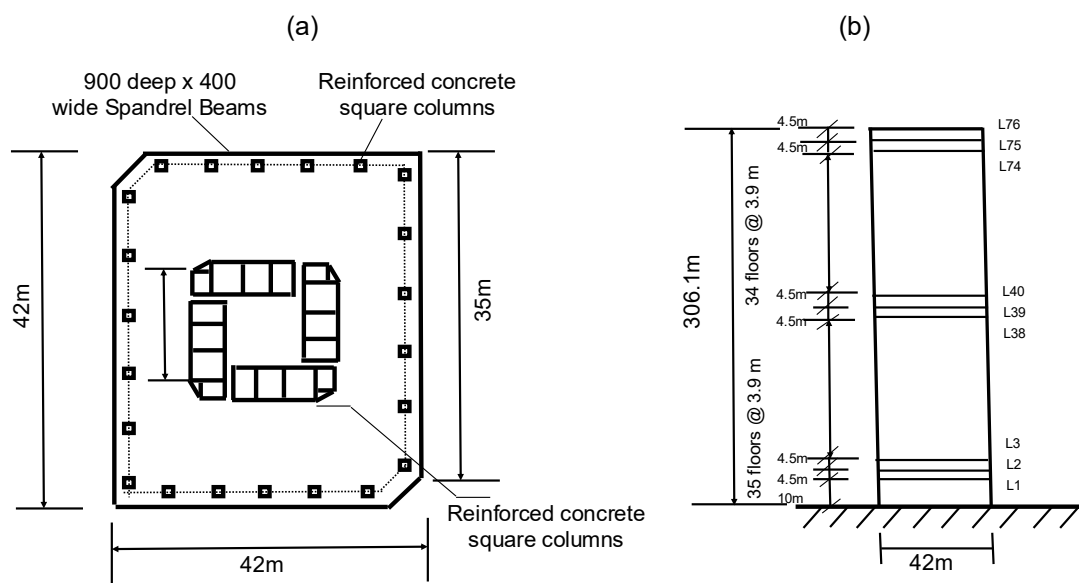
(a) Plan view and (b) elevation view of the 76-story benchmark structure (Yang et al., 2004)
